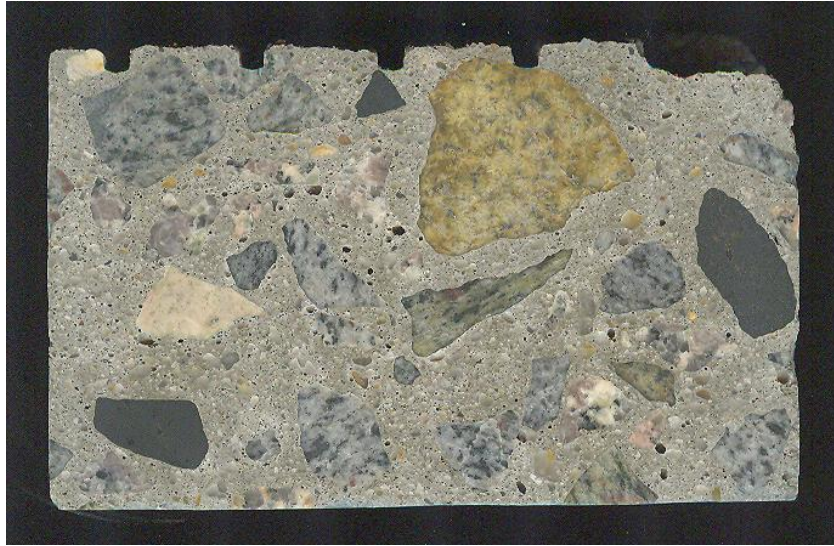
Scanned image of polished surface prepared from bridge deck 2N, core C-6. Bridge deck surface is at top.
